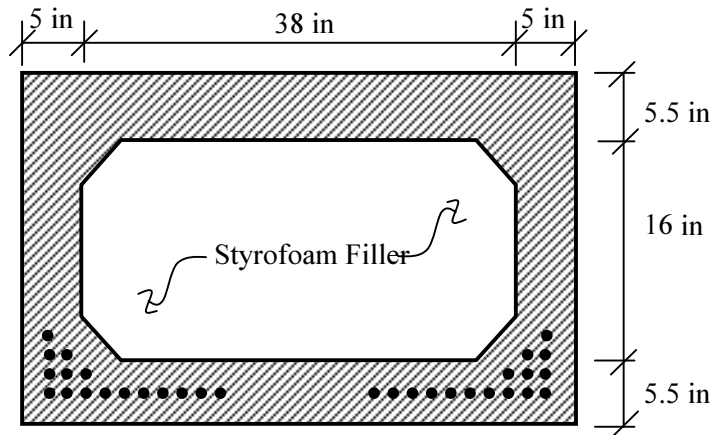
Cross-Section Dimensions of Box Girder Specimens
